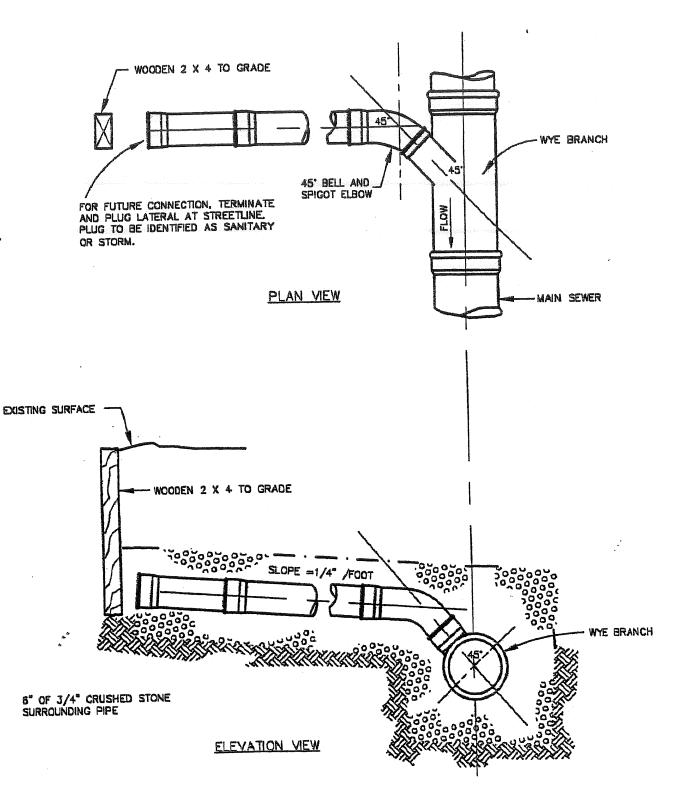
TYPICAL HOUSE LATERAL WYE CONNECTION DETAIL
